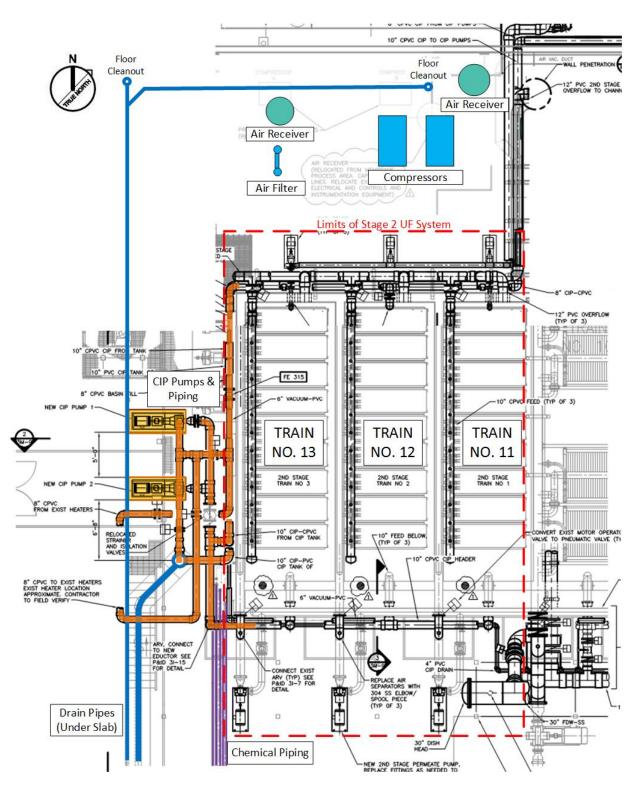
Existing Stage 2 Trains, Upper Plan View
